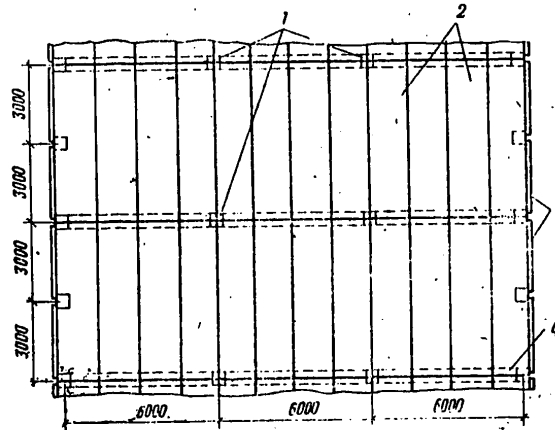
Schematic of structural-design decision of shelter (plan view)
